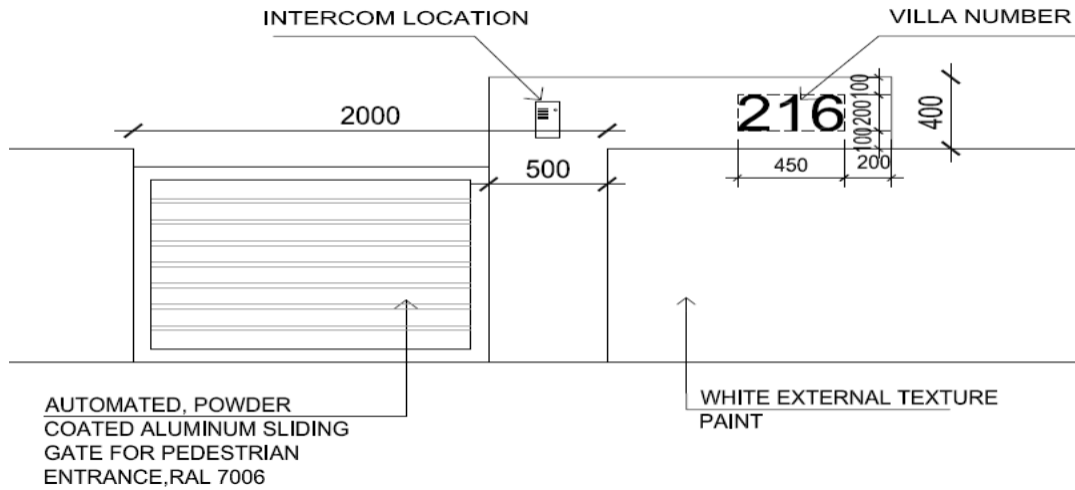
Mansion Front Boundary Wall Plan and Elevation)
